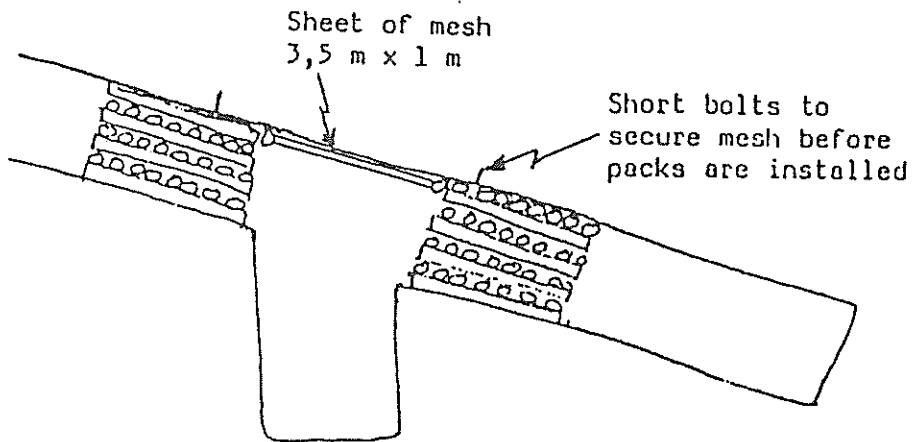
WIRE MESH STRIPS BRIDGING BETWEEN PACKS (POSSIBLY ASSISTED BY DIAGONAL STEEL BEAM SUSPENDED FROM CABLE LOOPS AT OPPOSITE CORNERS OF PACKS, SO AS TO CROSS GREATEST NUMBER OF FACE-PARALLEL HANGINGWALL SLABS)
